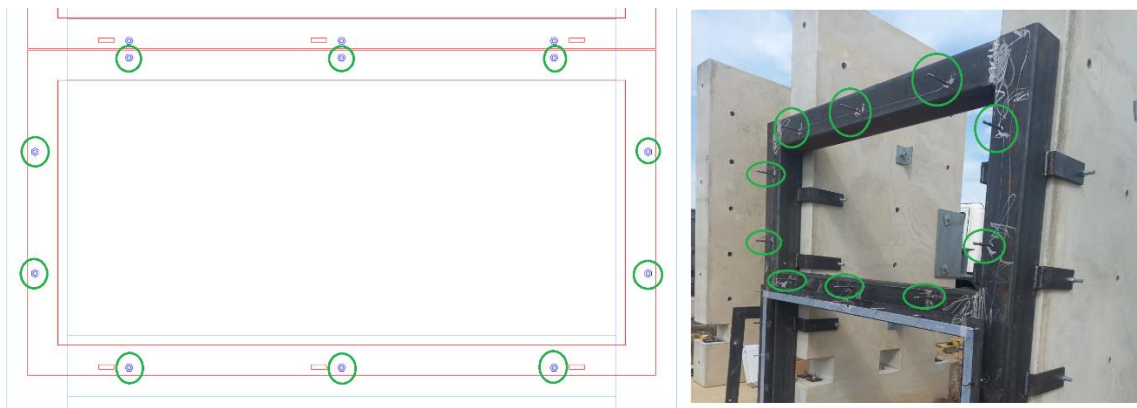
M12 Threaded bolts considered to be submitted to tension causing punching shear effects in the fixing plate
